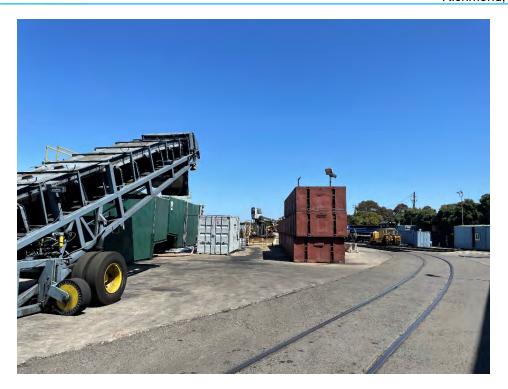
Looking north toward TS-2 (SW-5 area), Seams between asphalt on railroad tracks and concrete appear to be in good condition.
